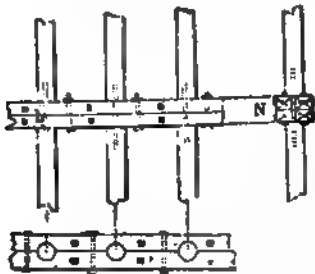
Plan O, elevation M, and cross section N, showing the arrangement of the capping of the foundation piles with the uprights.
